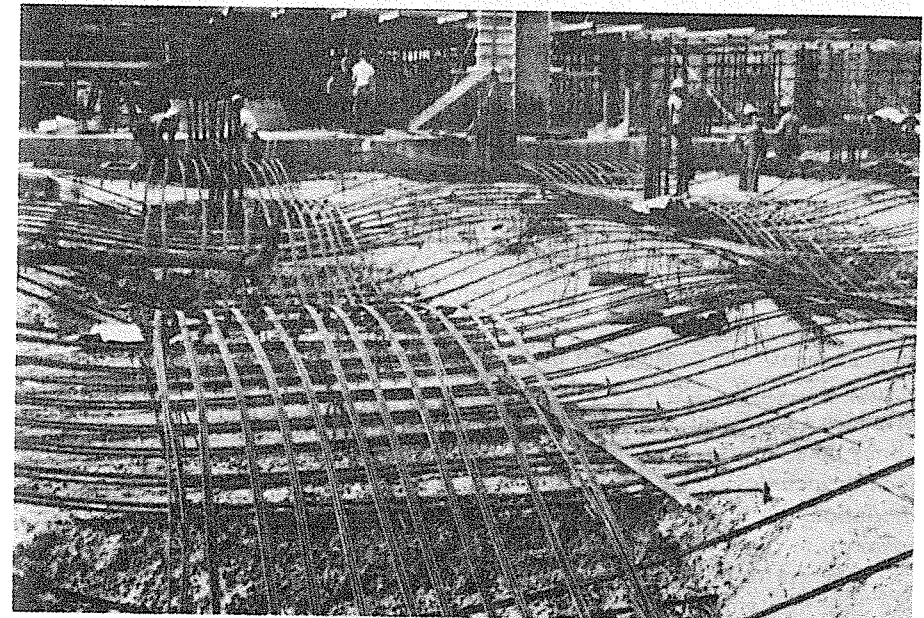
Prestressed concrete pavement. Adapted from Ref. 13.23.
